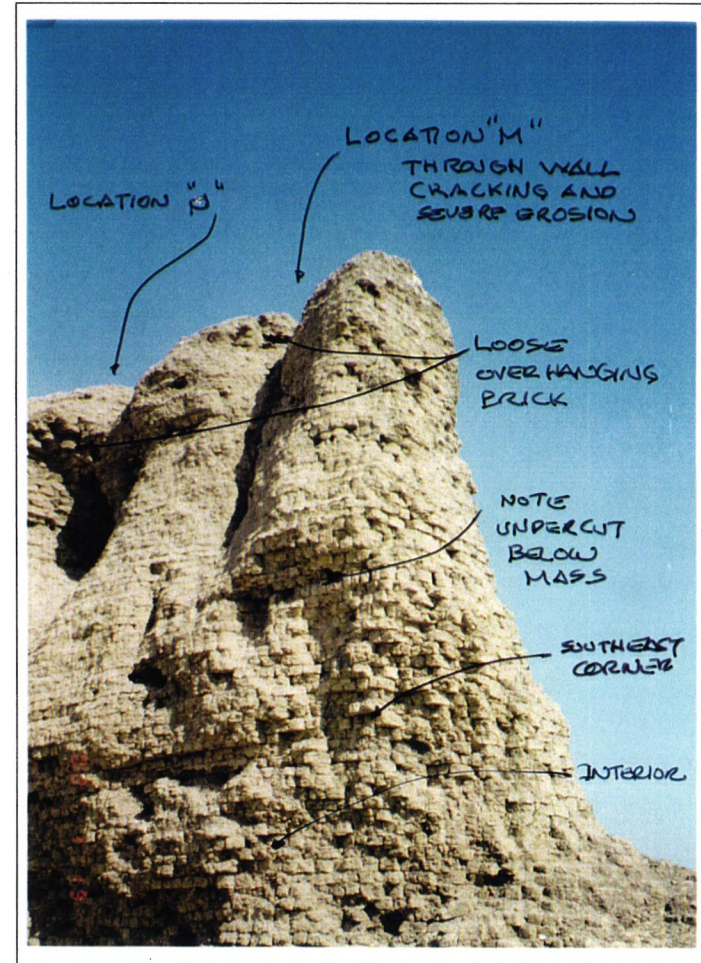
"Section 4" East Main Enclosure Wall Interior View
